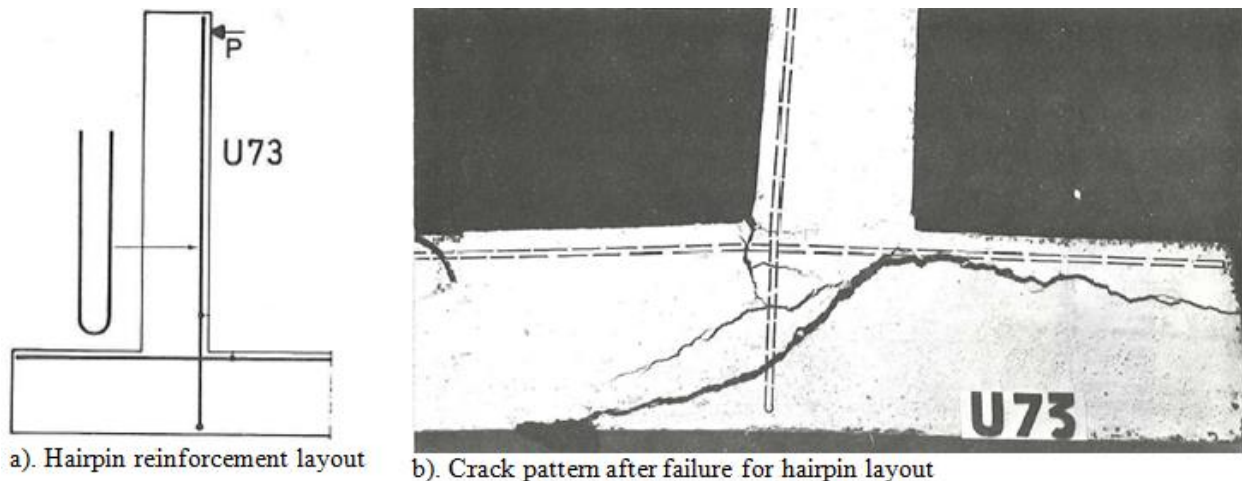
Retaining wall corner detail with hairpin reinforcement (Nilsson, 1973)
